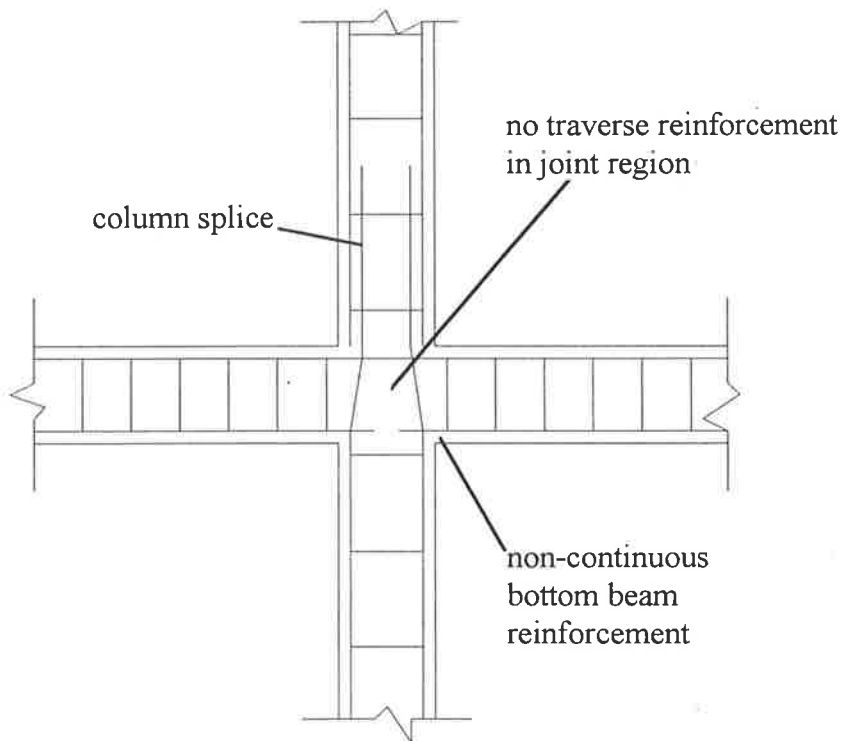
Lightly-Reinforced Beam-Column Connection
